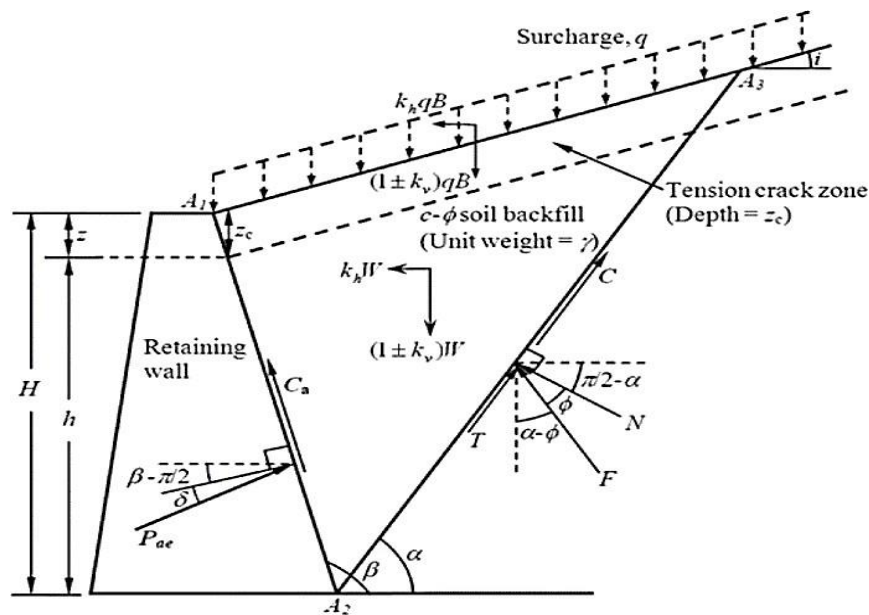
Forces in a trial failure wedge of an inclined retaining wall for $c-\phi$ soil backfill in active state (after Shukla [7])
